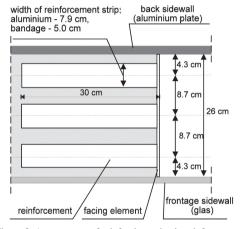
Arrangement of reinforcing strips in reinforcement layer.
